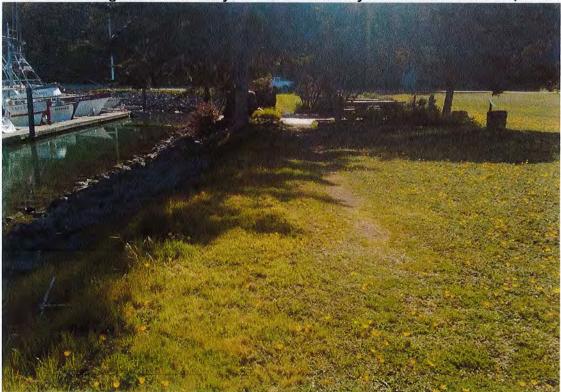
Looking south along the top of bank along the Noyo River and marina. Note existing path to picnic tables to be refurbished. Photo taken March 31, 2022.
